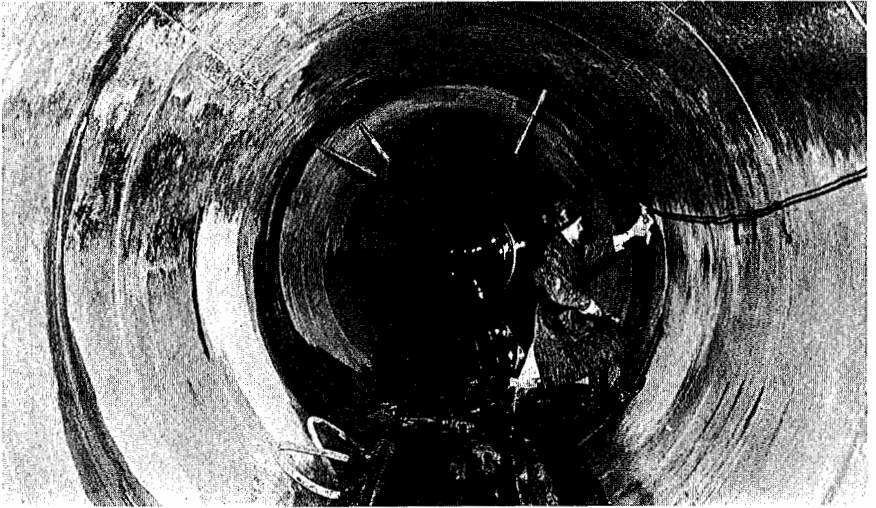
Between shafts 7 and 7B, showing concrete lining, which, in this branch tunnel is only 10 feet in diameter. 4|20|49.
